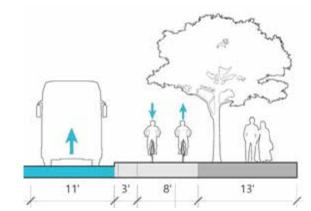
Bus on an Typical Arterial Street with a Two-Way, Sidewalk-Level Class IV Bikeway.
